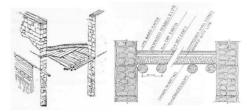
A partially detailed section showing the construction system and a Typical section showing roof and ceiling construction [15]
